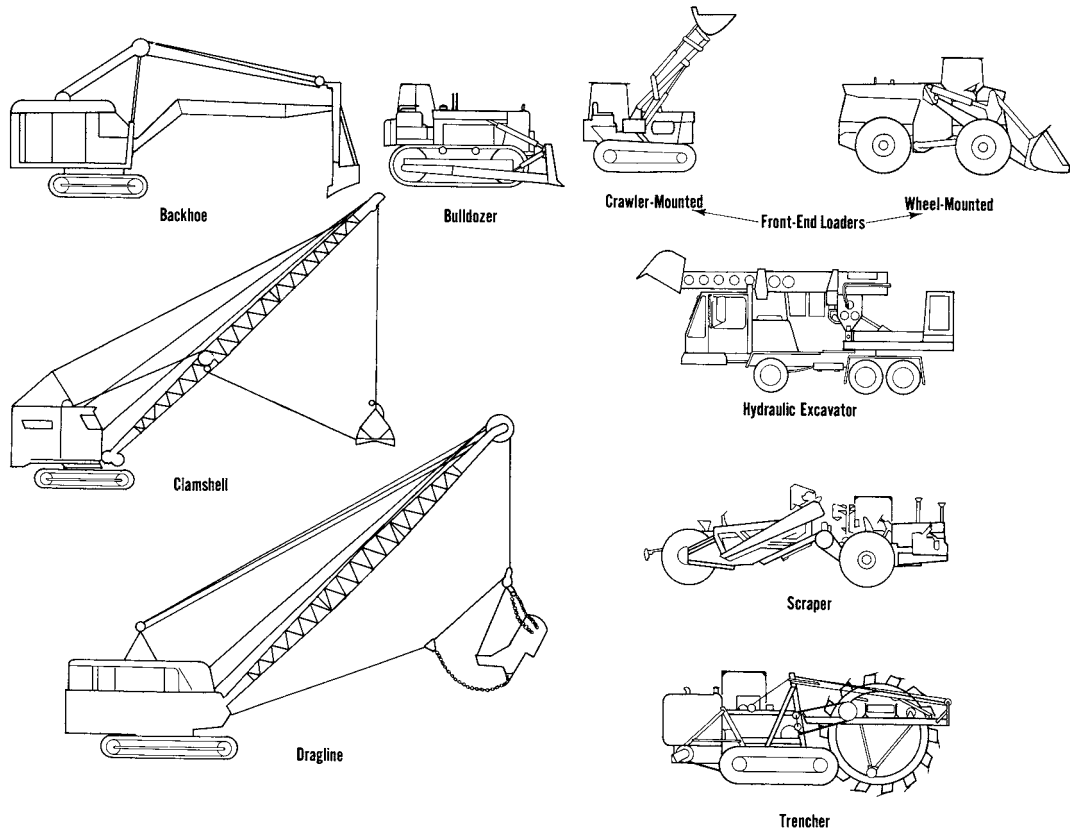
Typical excavation equipment. (Courtesy of American Concrete Pipe Association)
